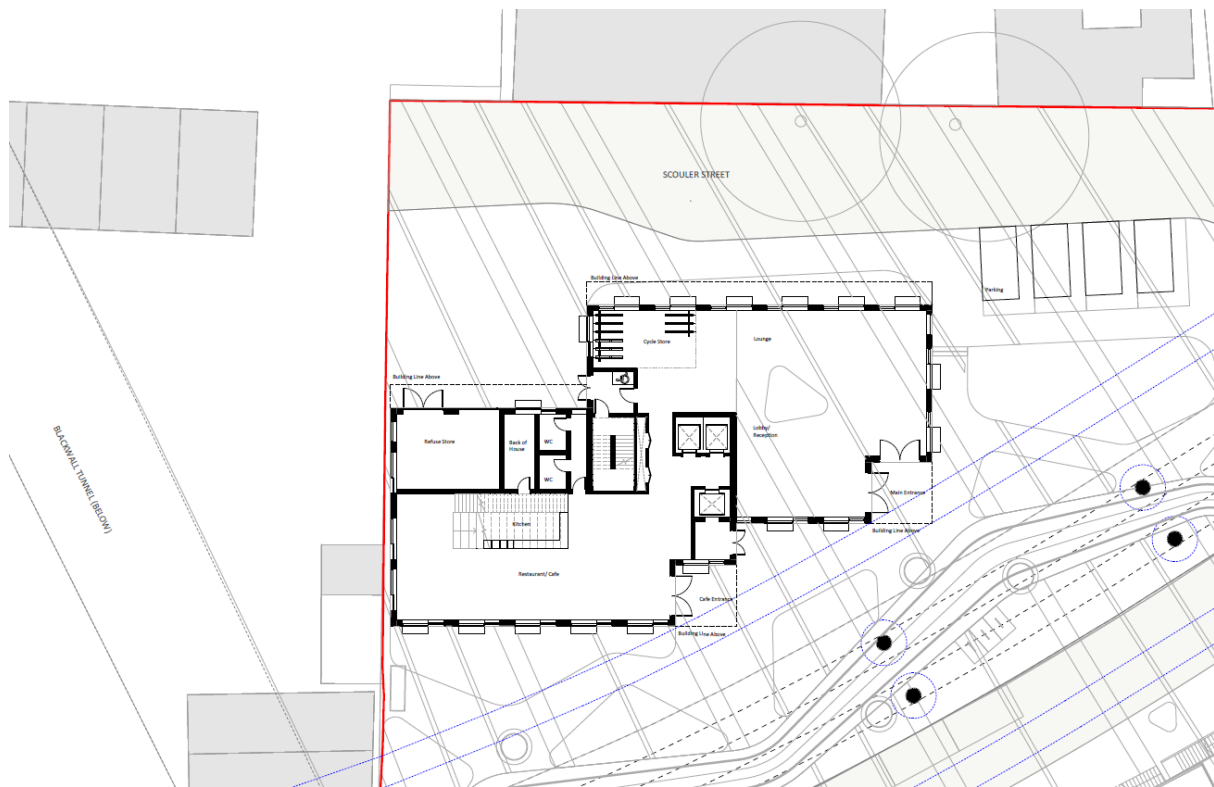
DLR Exclusion Zone (Proposed GF Plan)
